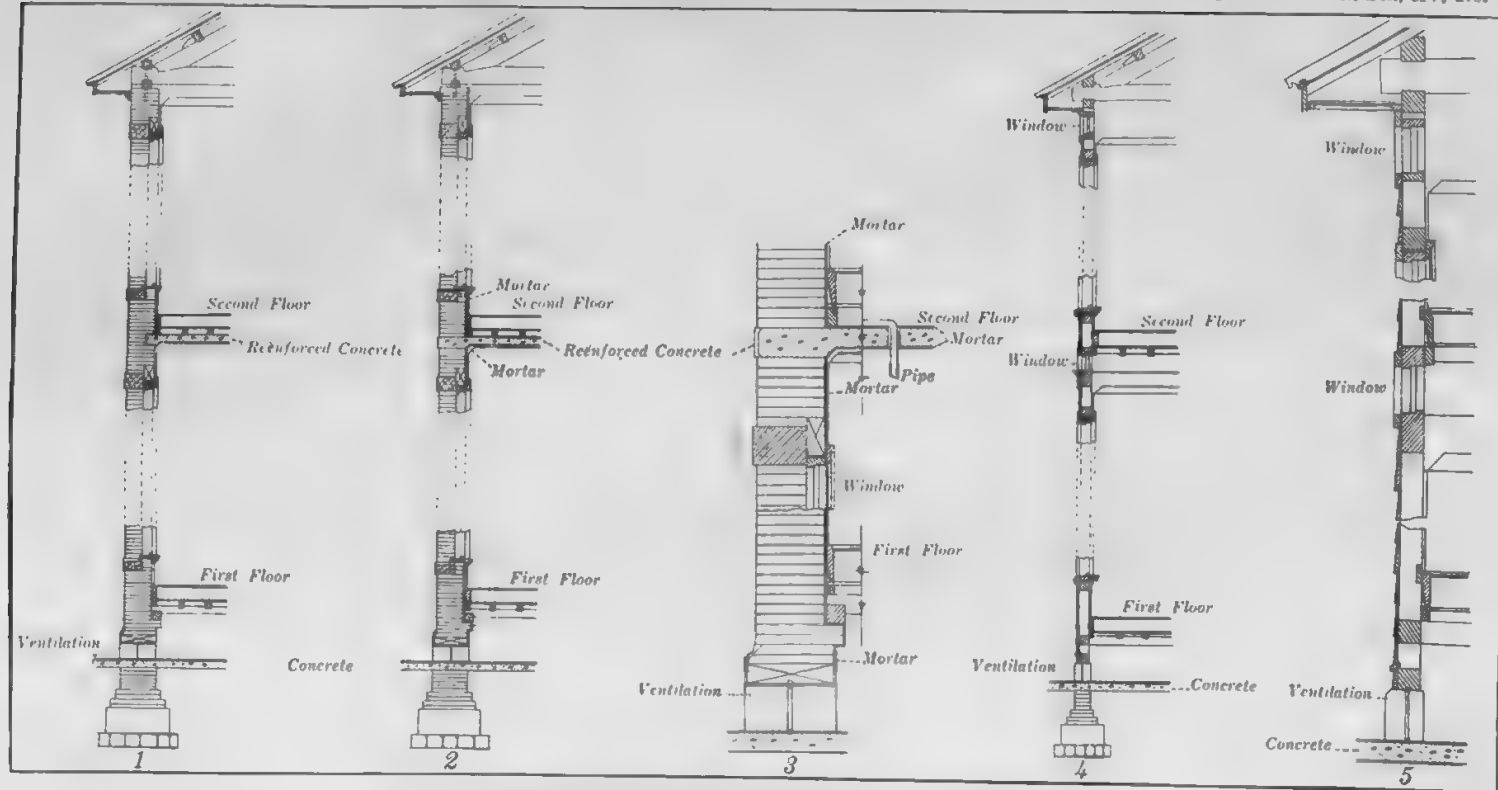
PLATE XIII. EXAMPLES OF TERMITE-PROOF BUILDING CONSTRUCTION.
